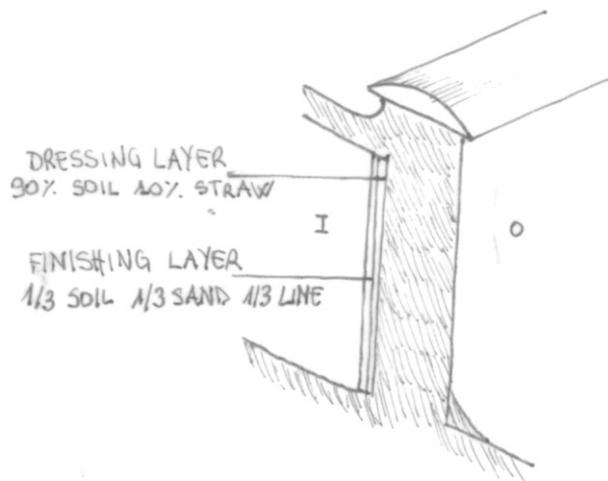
Application of two strata of plaster on the internal surface of a wall
